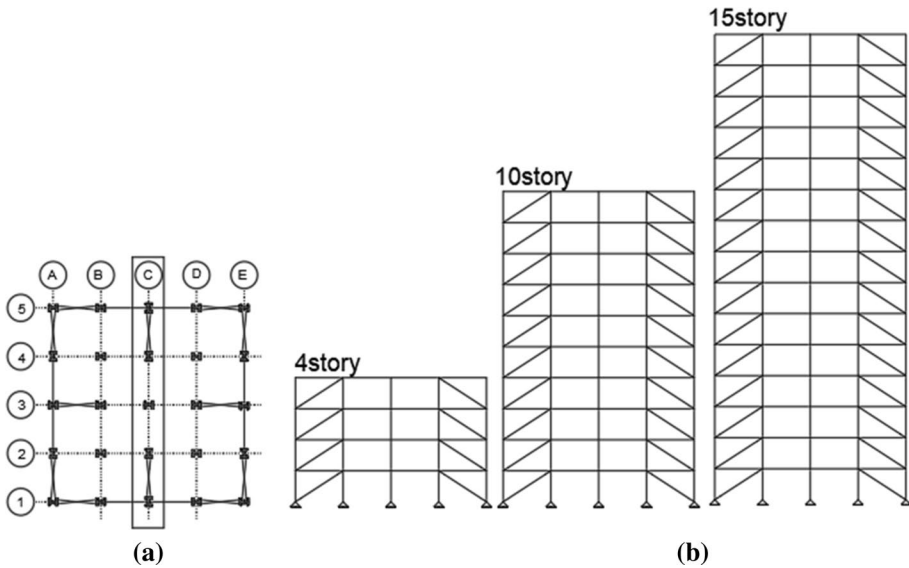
a Plan view, b elevation view of buckling restrained braced frames
